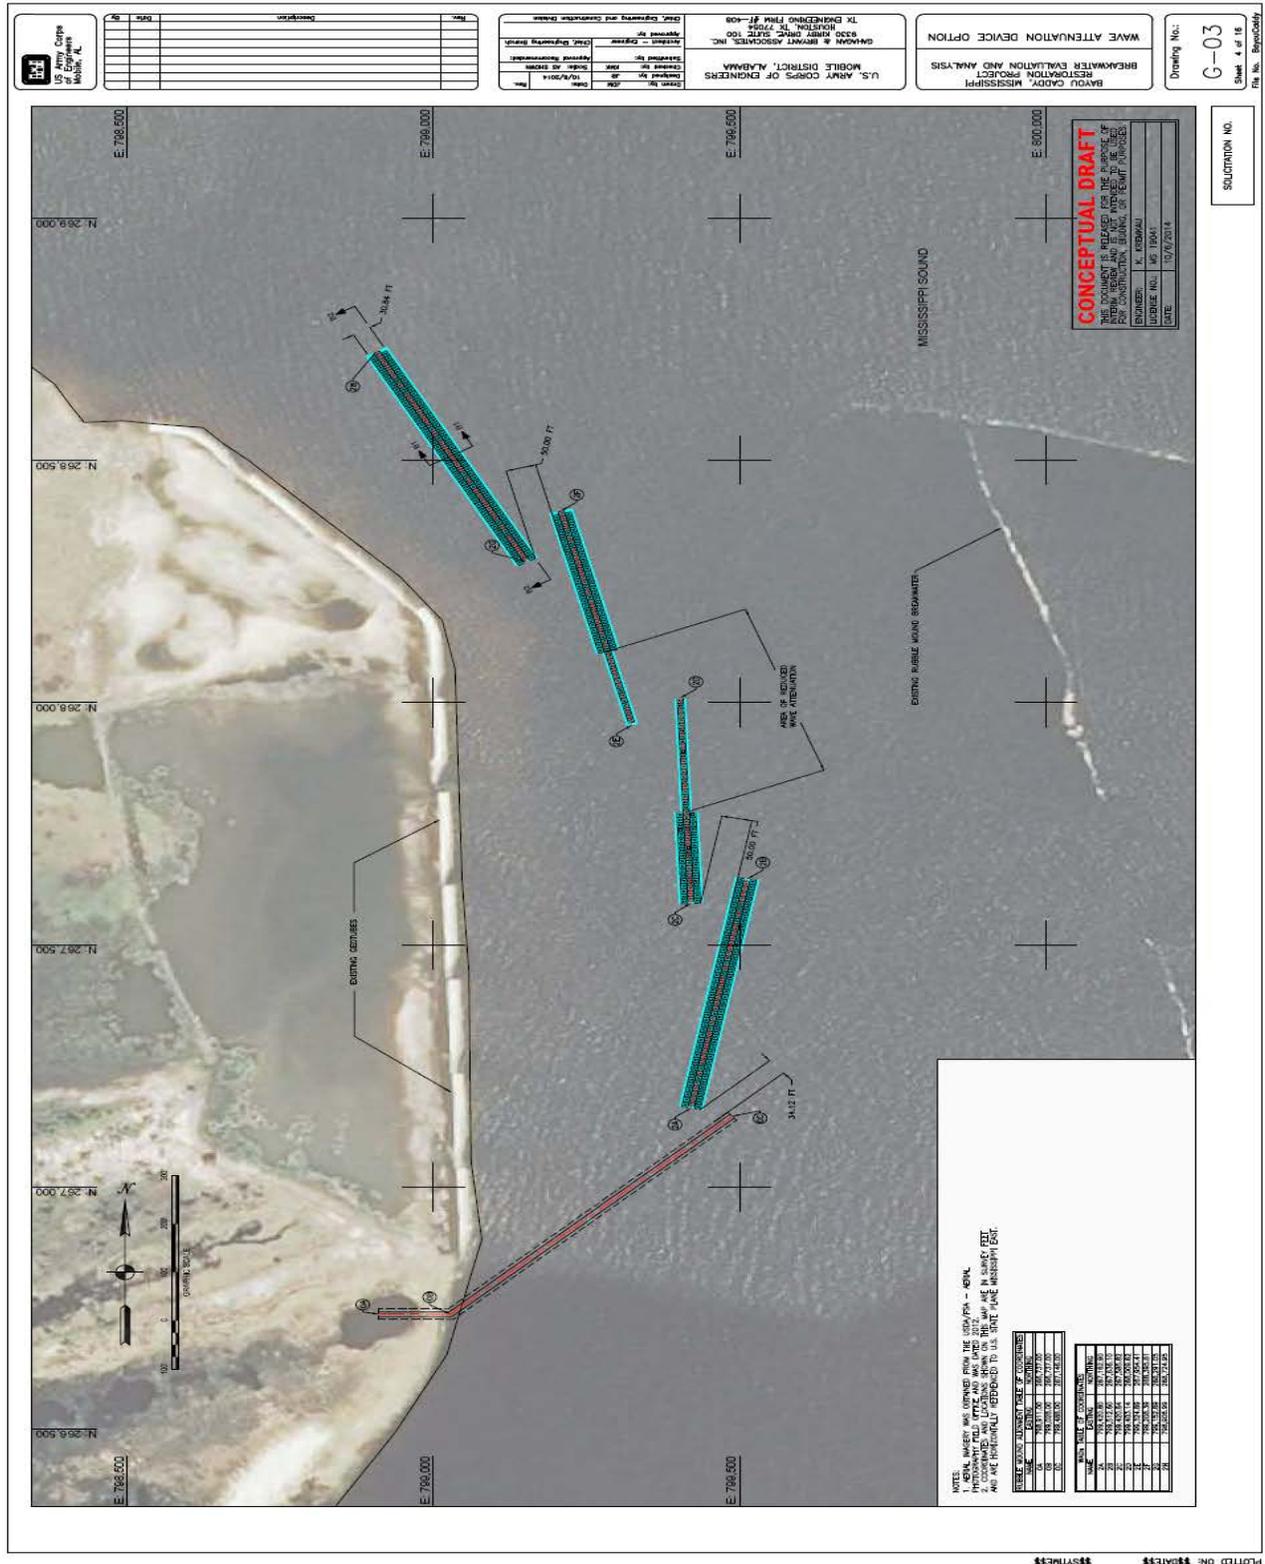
Proposed Breakwater and Living Shoreline Site Plan for Bayou Caddy
